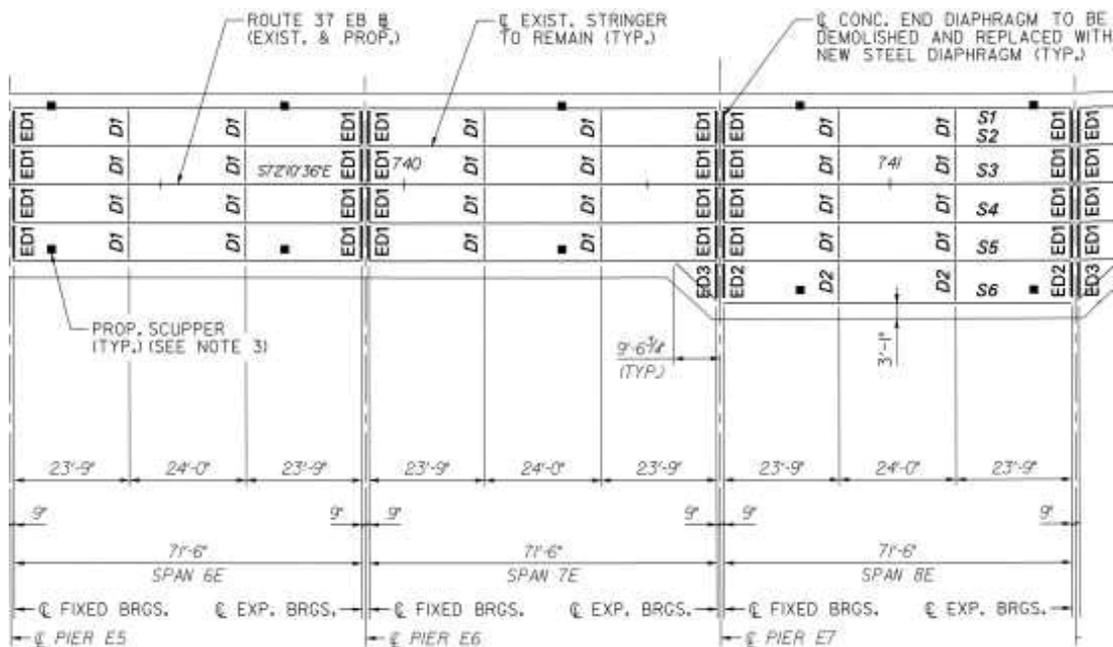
Existing Framing Plan depicting a standard span, widened parking span, and intermediate/transition span
